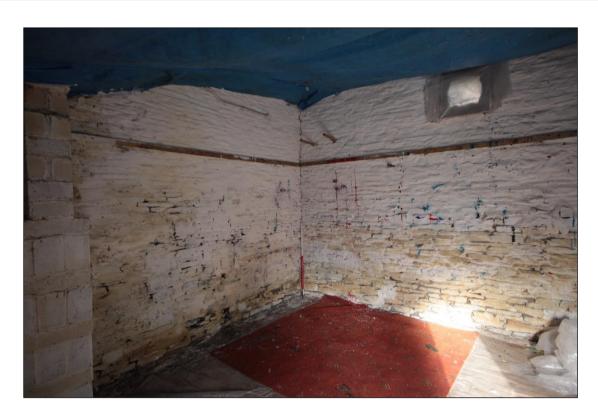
View of the north and west interior walls of the shelter shed extension, with 1m scale.
